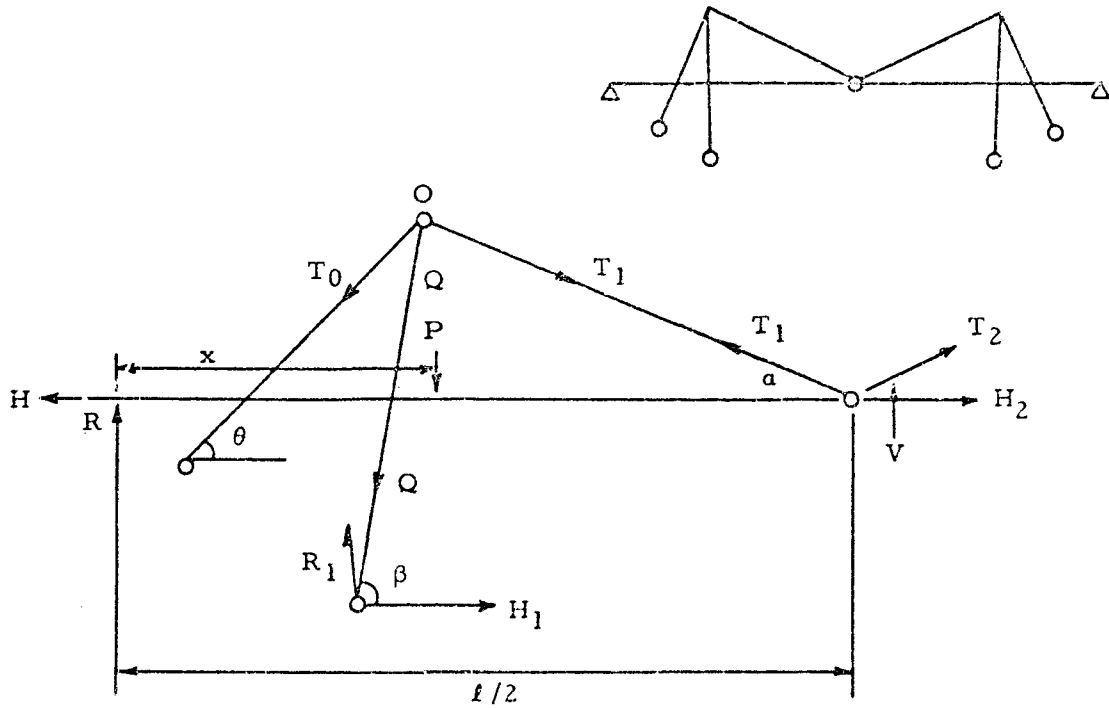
LEANING PIERS BRIDGE, ELEVATION VIEW
